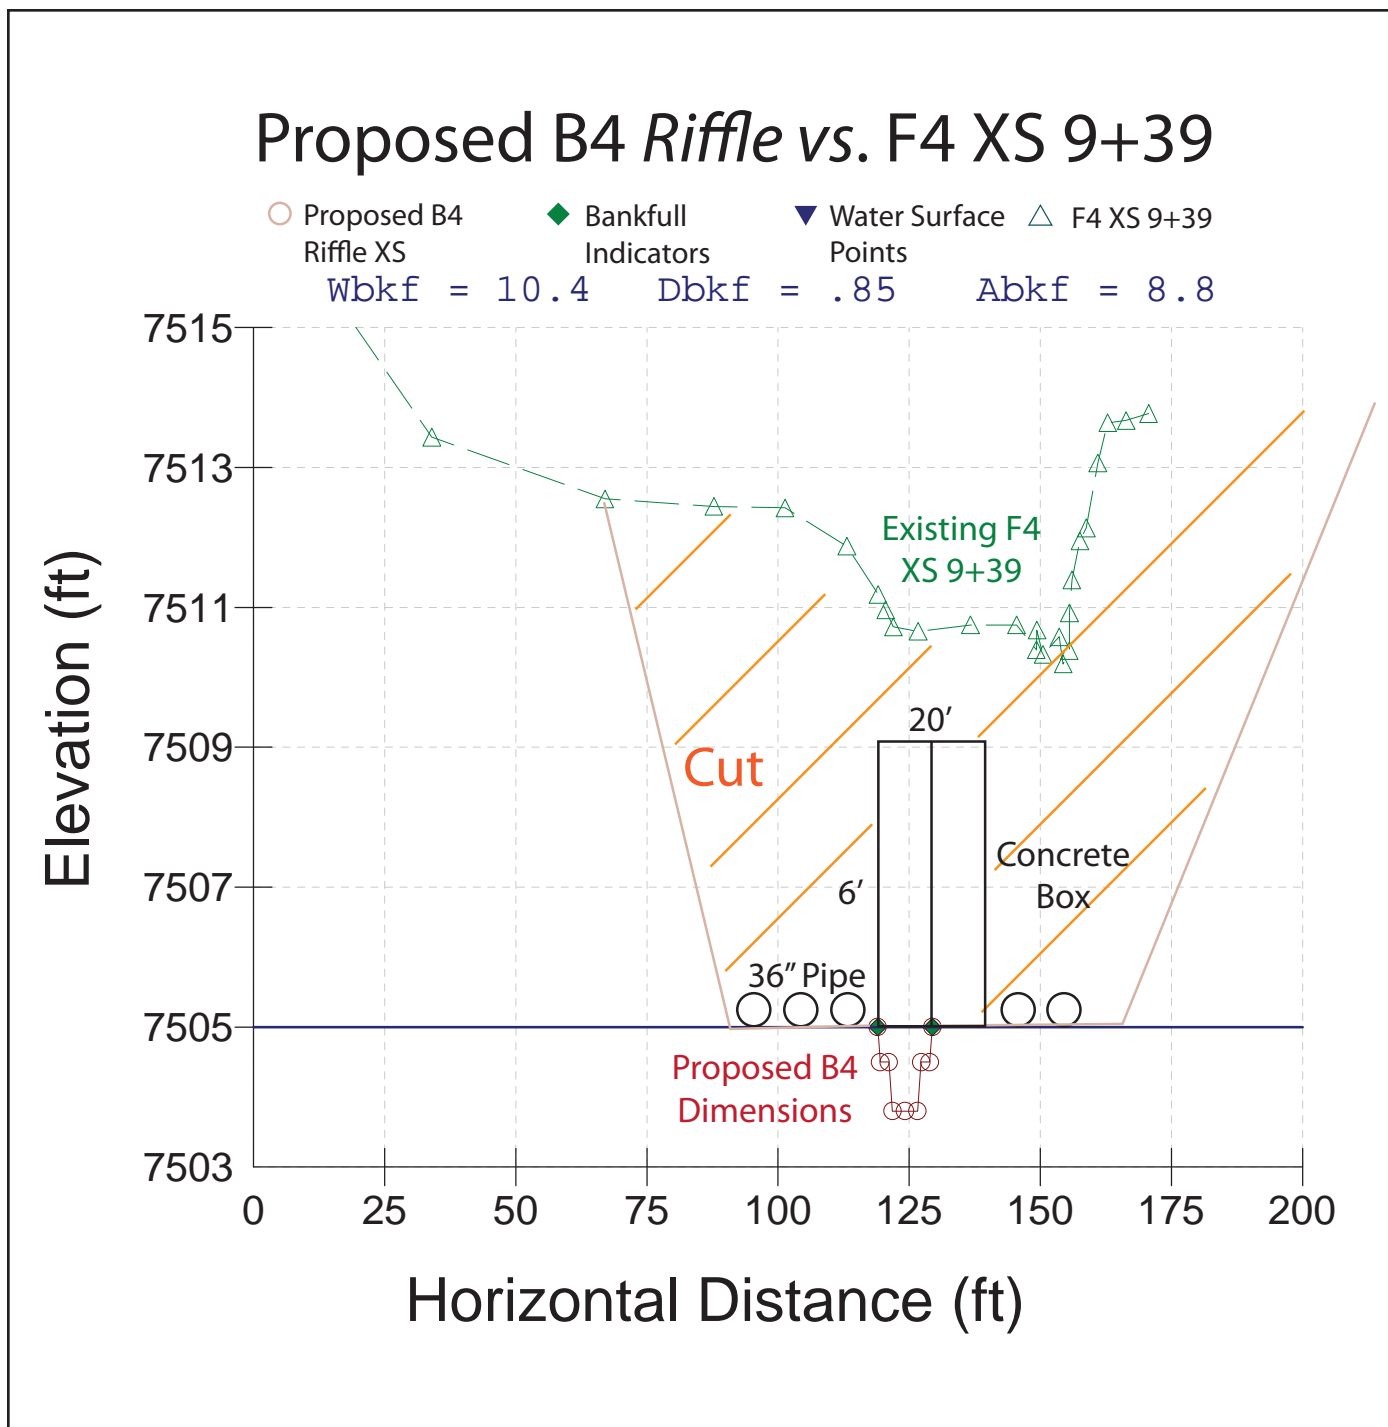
The proposed B4 riffle cross-section compared to the existing F4 cross-section 9+39, indicating the substantial excavation required.
